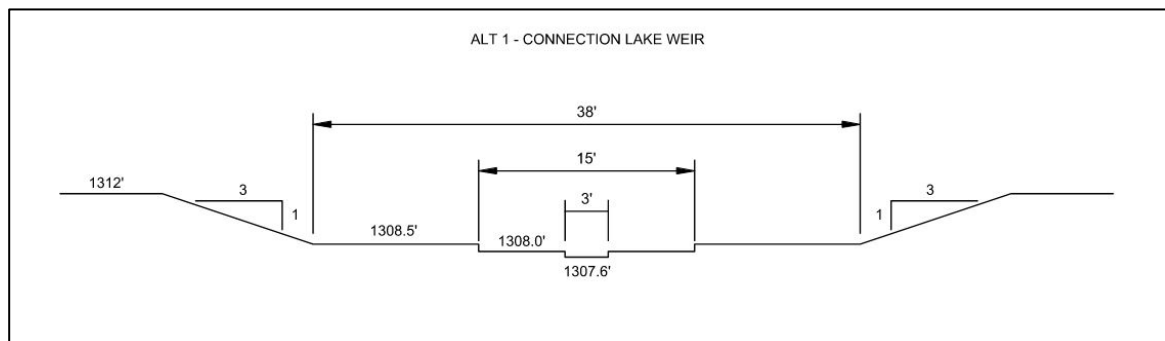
Alternative 1 Connection Lake Outlet Structure Layout
